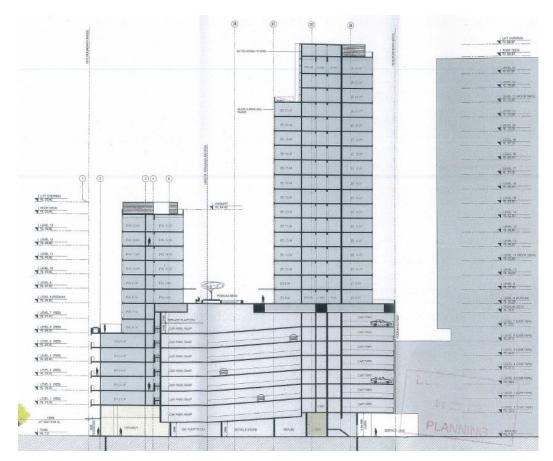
; Section of approved development on Lot R5 immediately to north (as per Permit 2013/007431 issued by the Minister). Form shown on right hand side of image is indicative only and not representative of proposed form (source: application plans prepared by SJB)
